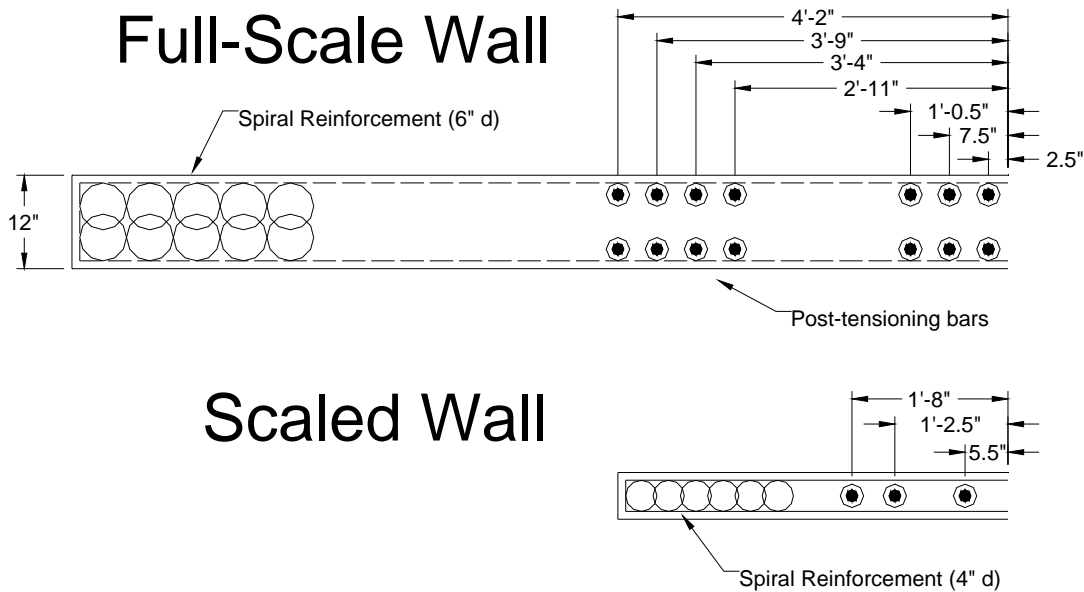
Spiral and post-tensioning bar layout of full-scale and scaled walls.
